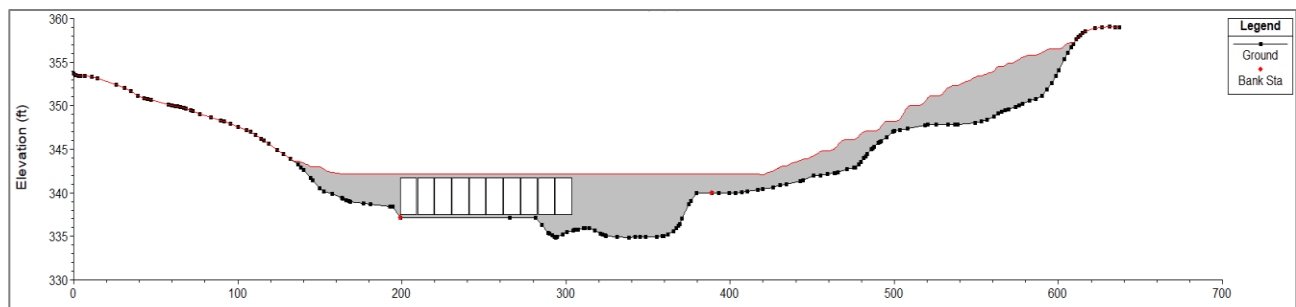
Existing Sandia Creek Drive Bridge Cross-Section (HEC-RAS)
